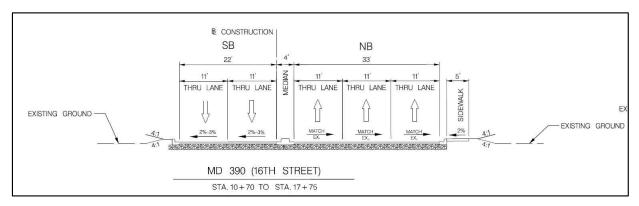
Proposed Cross Section – 16th Street between Georgia Avenue and Grace Church Road
